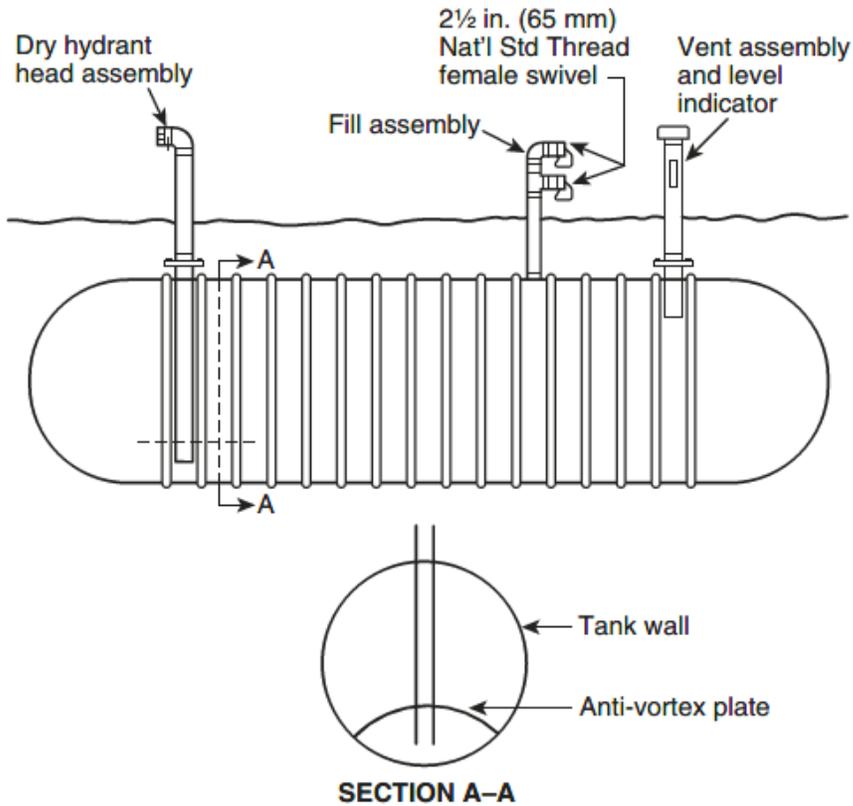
Example of Construction of Water Cisterns Using an Underground Fiberglass Storage Tank.
